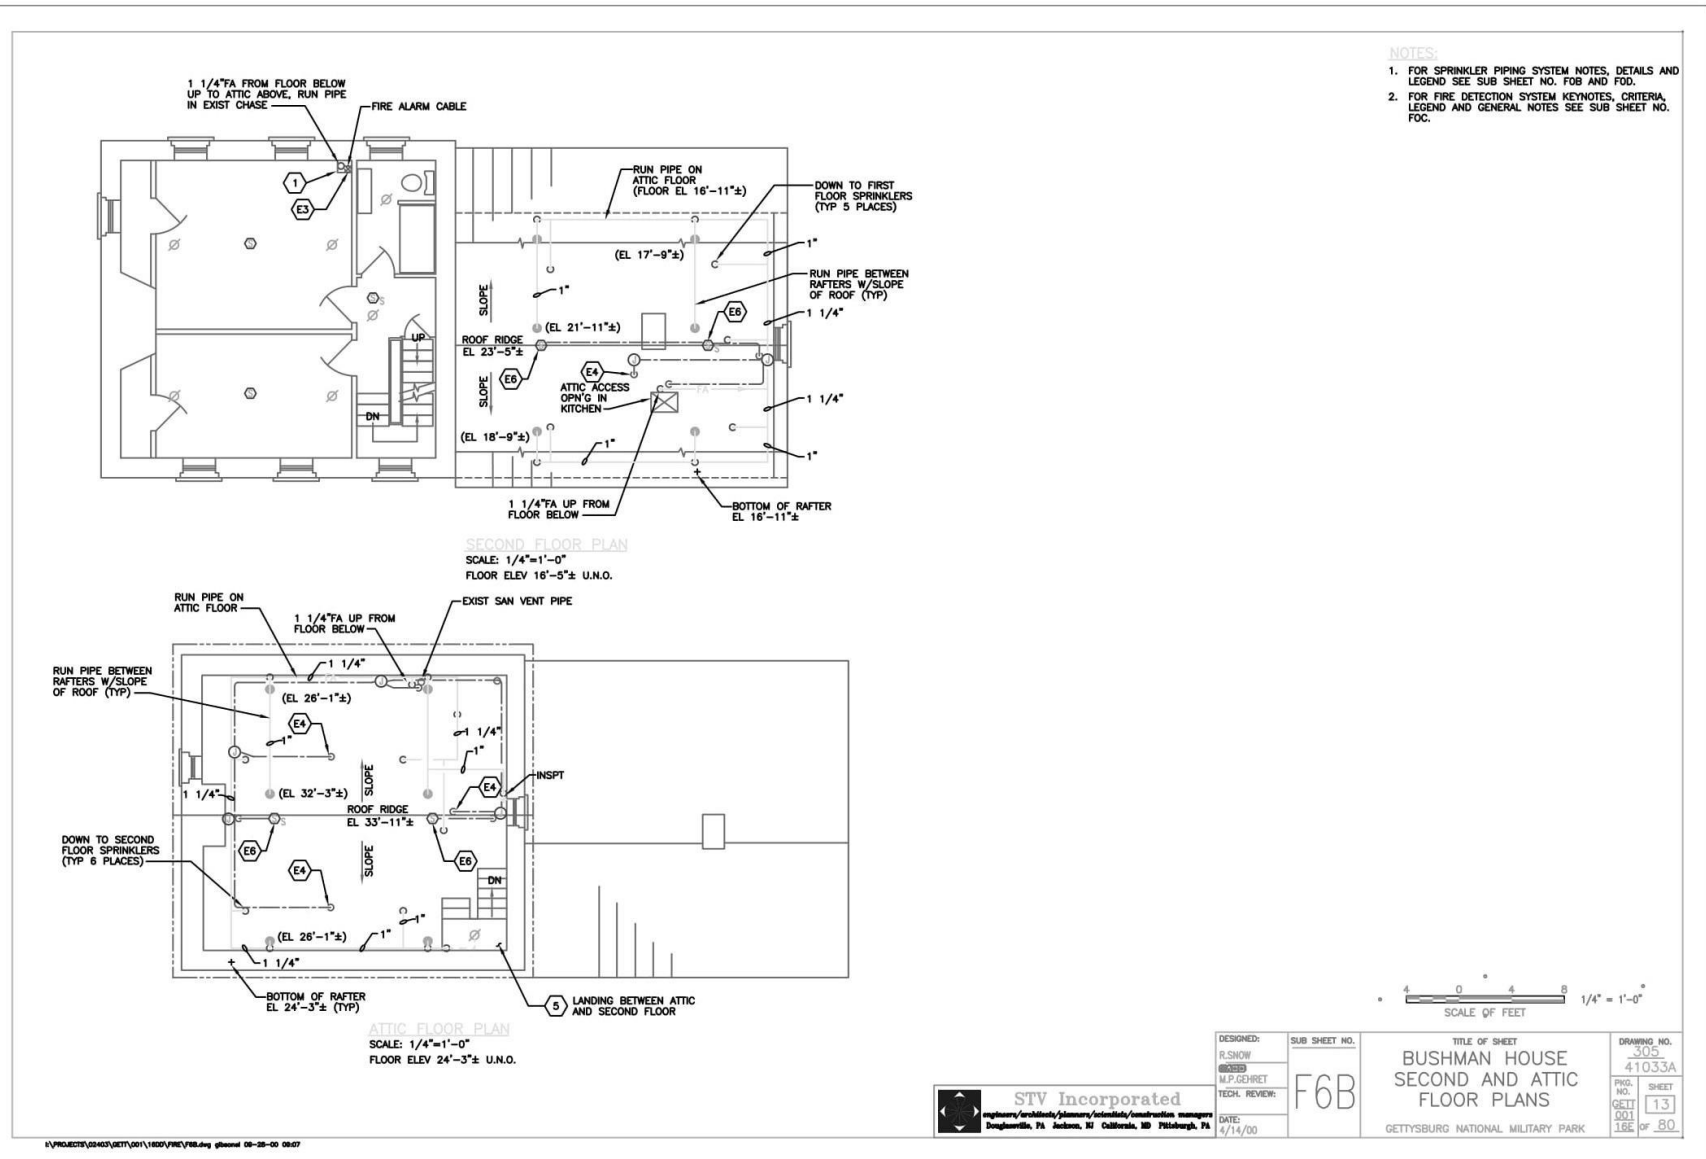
Bushman Farmhouse floor plans – second floor and attic.
